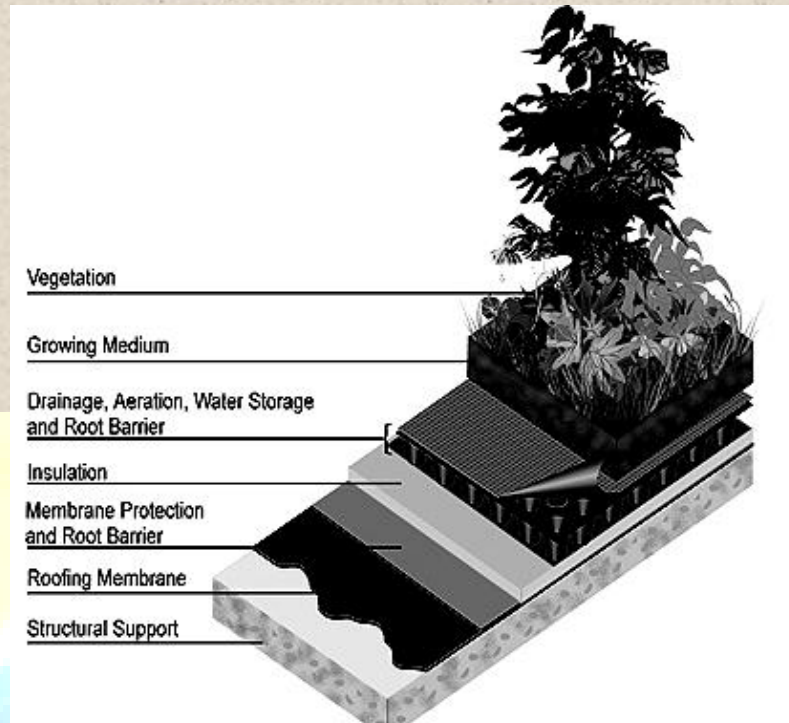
Green roof layers (Source: American Wick Drain Corp.)
